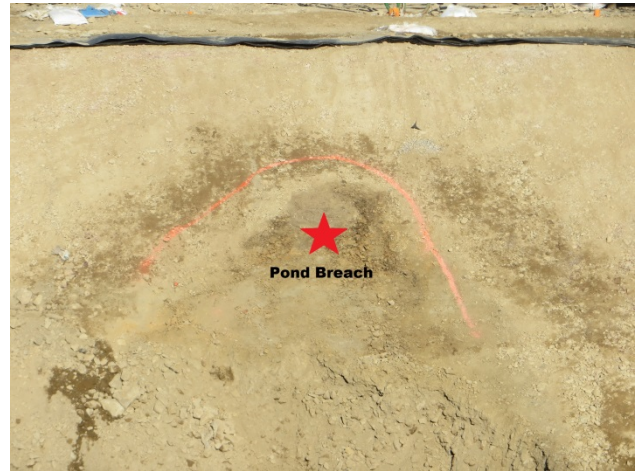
Looking west at delineation of minimum excavation limits in liner breach area
